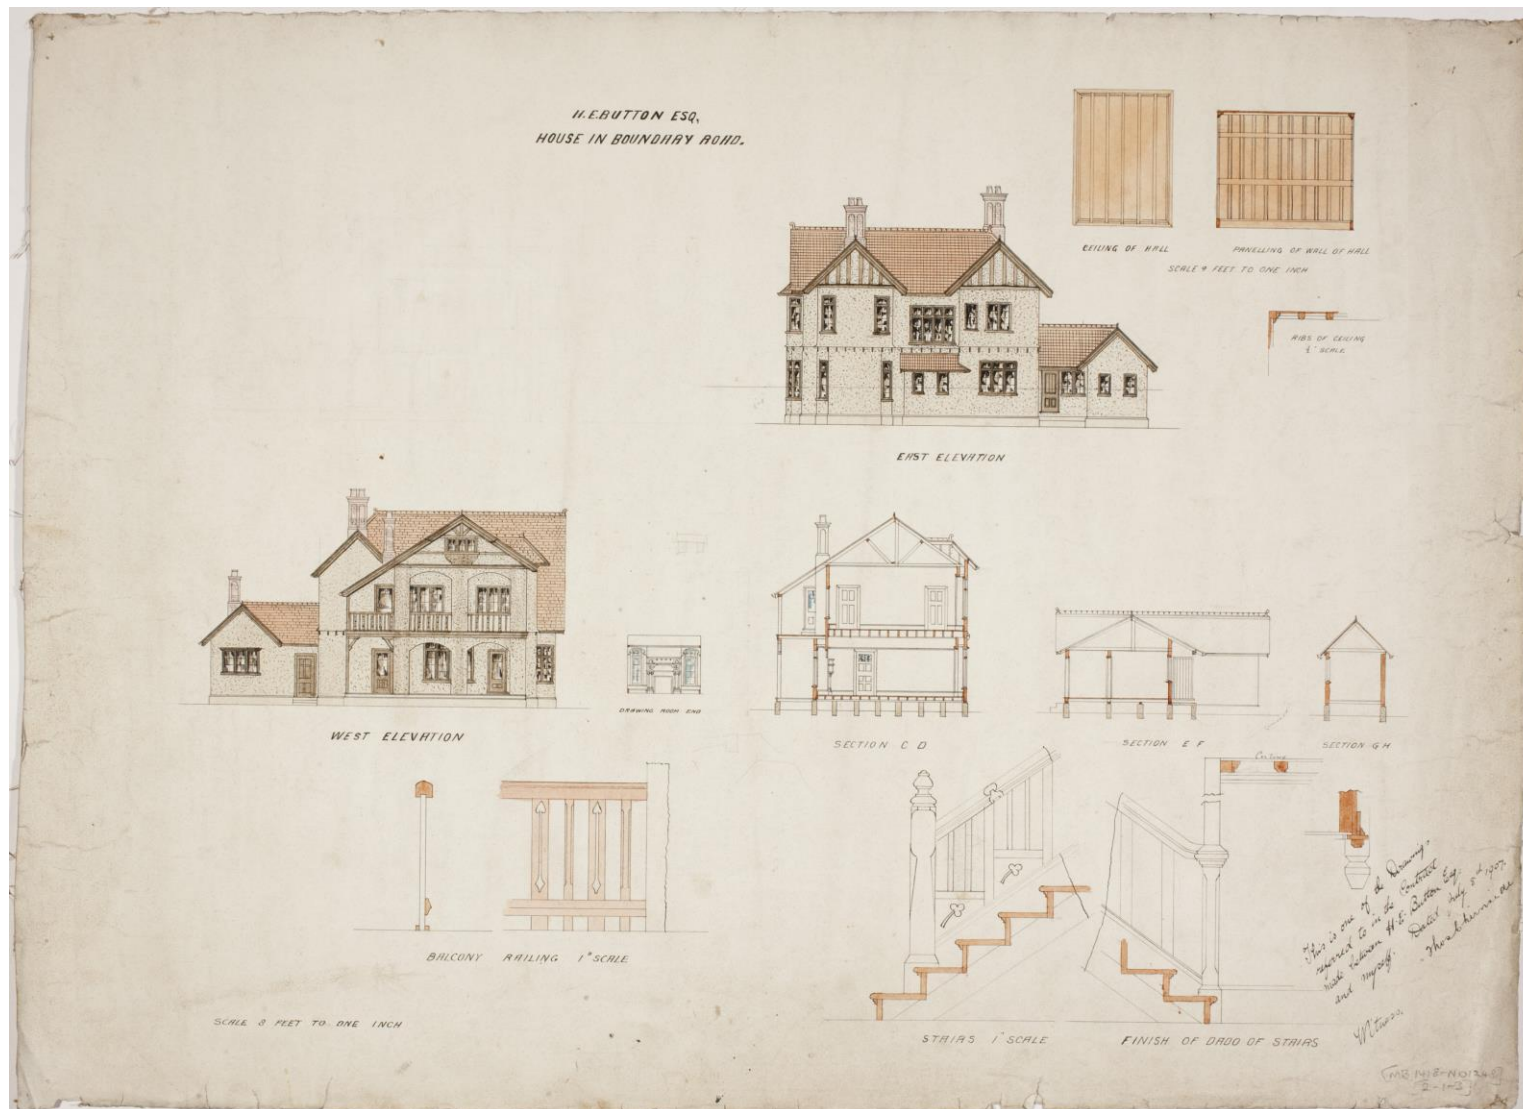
Collins and Harman, H. E. Button, Esq., House on Boundary Road, elevations, sections and details (1907).
